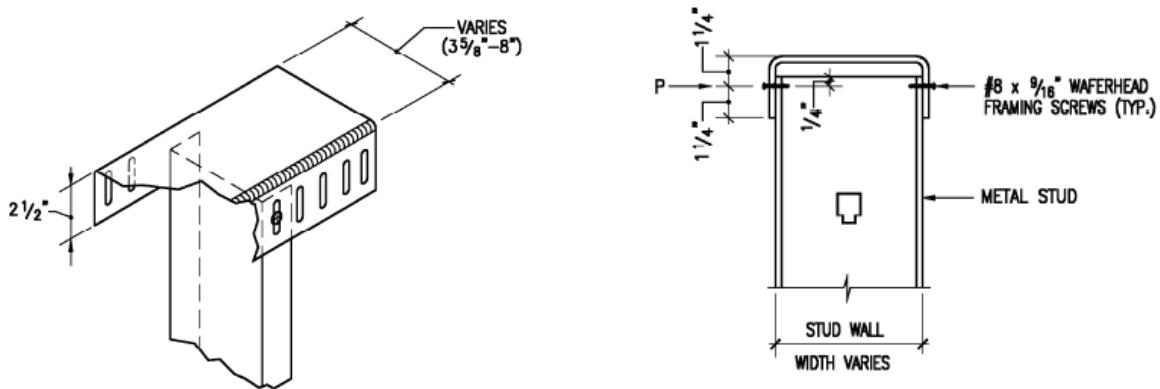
Typical connection between studs and vertically-slotted top tracks (source: <http://www.sliptrack.com>)
